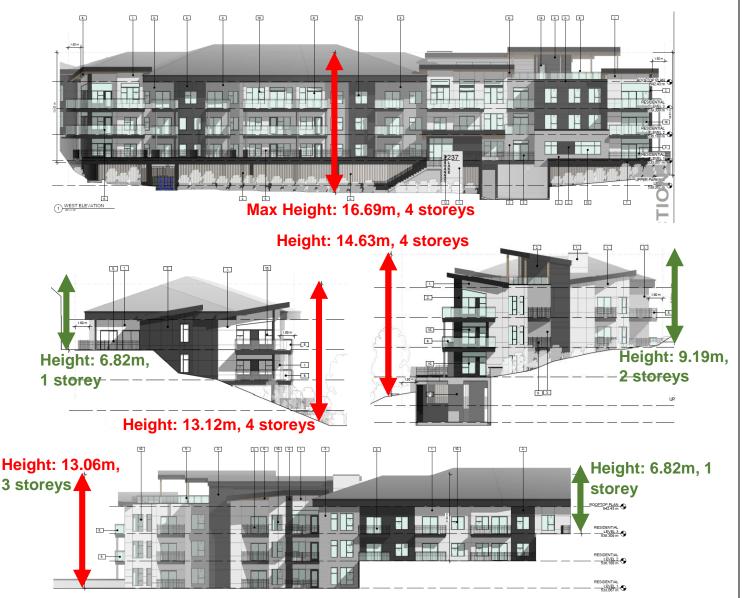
Top: Front elevation; Middle Left: Side elevation north; Middle Right: Side elevation south; Bottom: Rear elevation.
